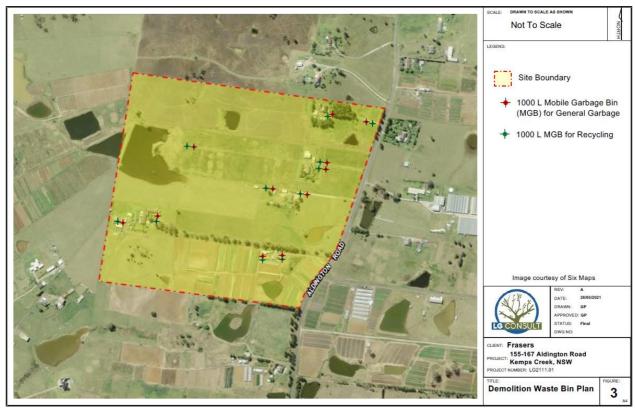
Demolition Waste Bin Plan (Source: LG Consult 2021)
